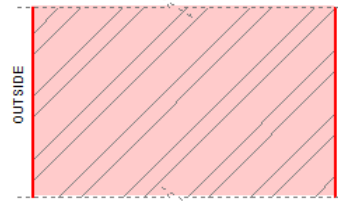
Mud bricks specification for the first building in Ecotect analysis
